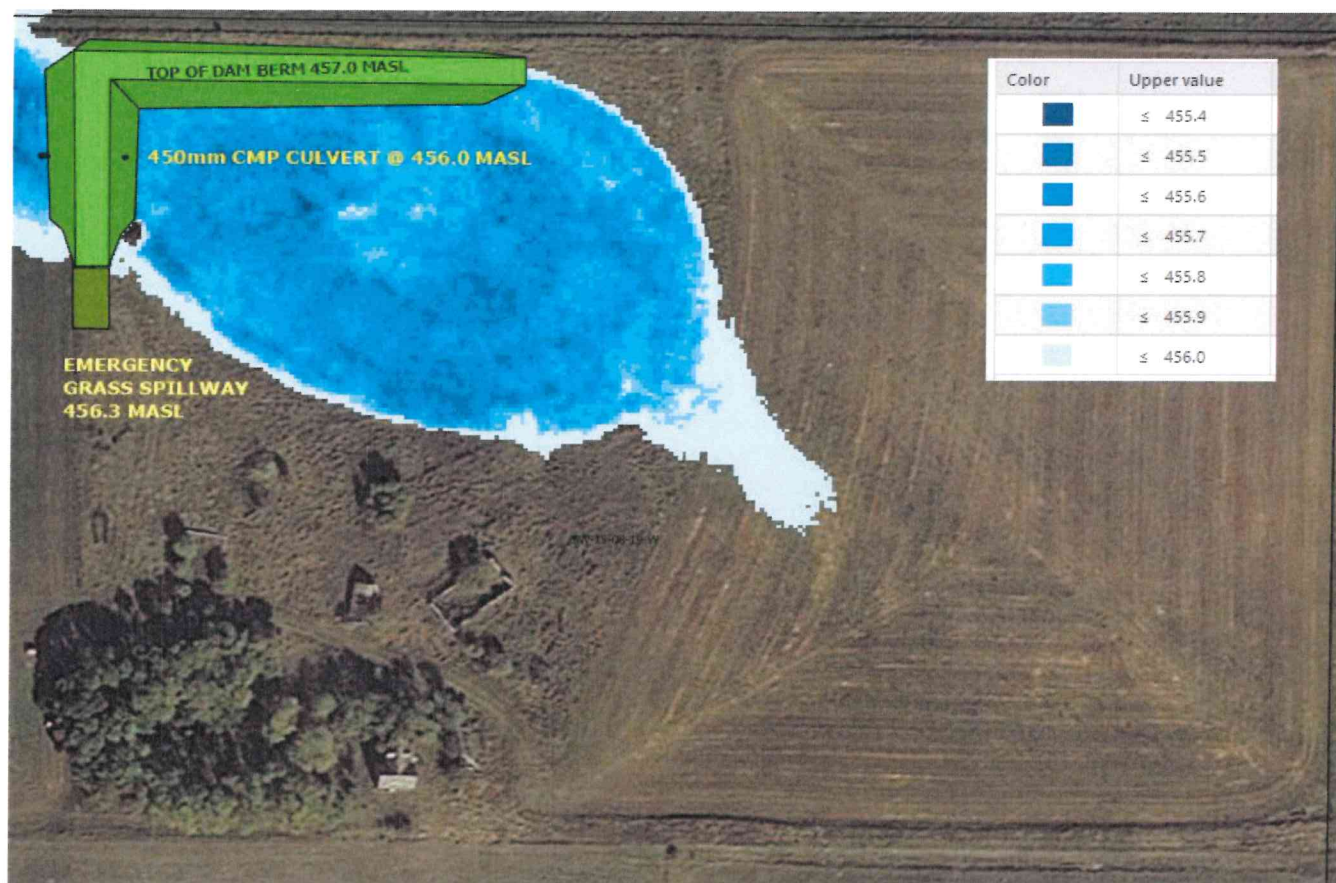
Aerial Plan of Driedger Dam showing ponded water
